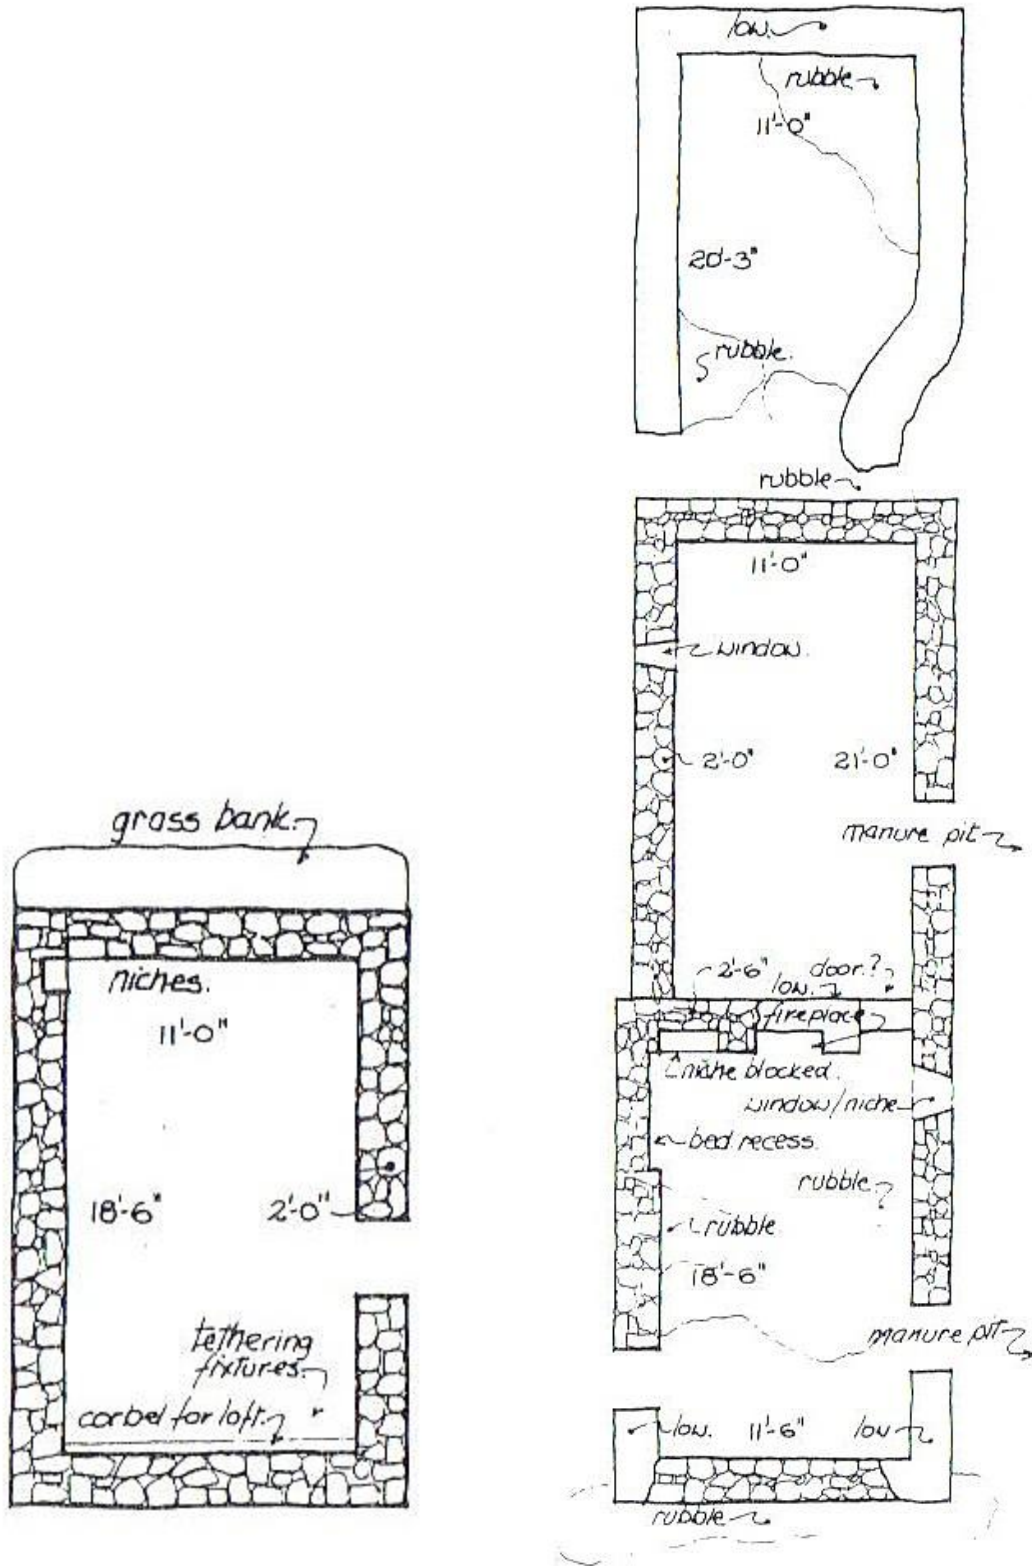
Plan of average one room house and plan of house with additions. (Kingston 1990)
